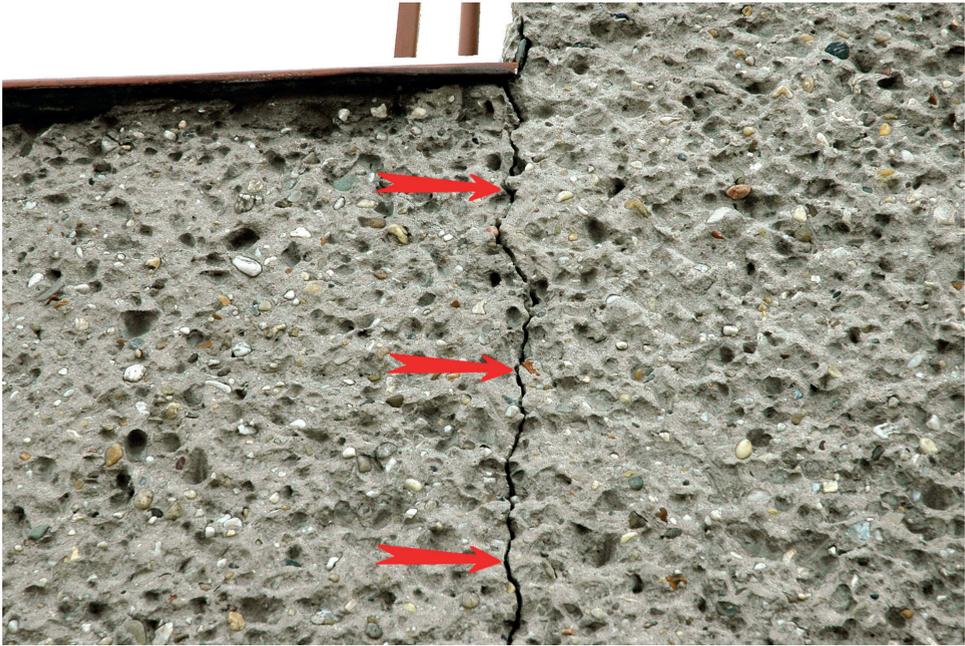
Fragment of the northern wall – vertical crack at the junction of the extension C with the main body of the building. *Source: author
